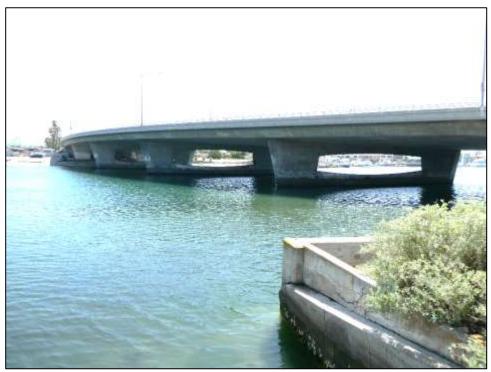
North elevation, camera facing southeast, April 5, 2022.
